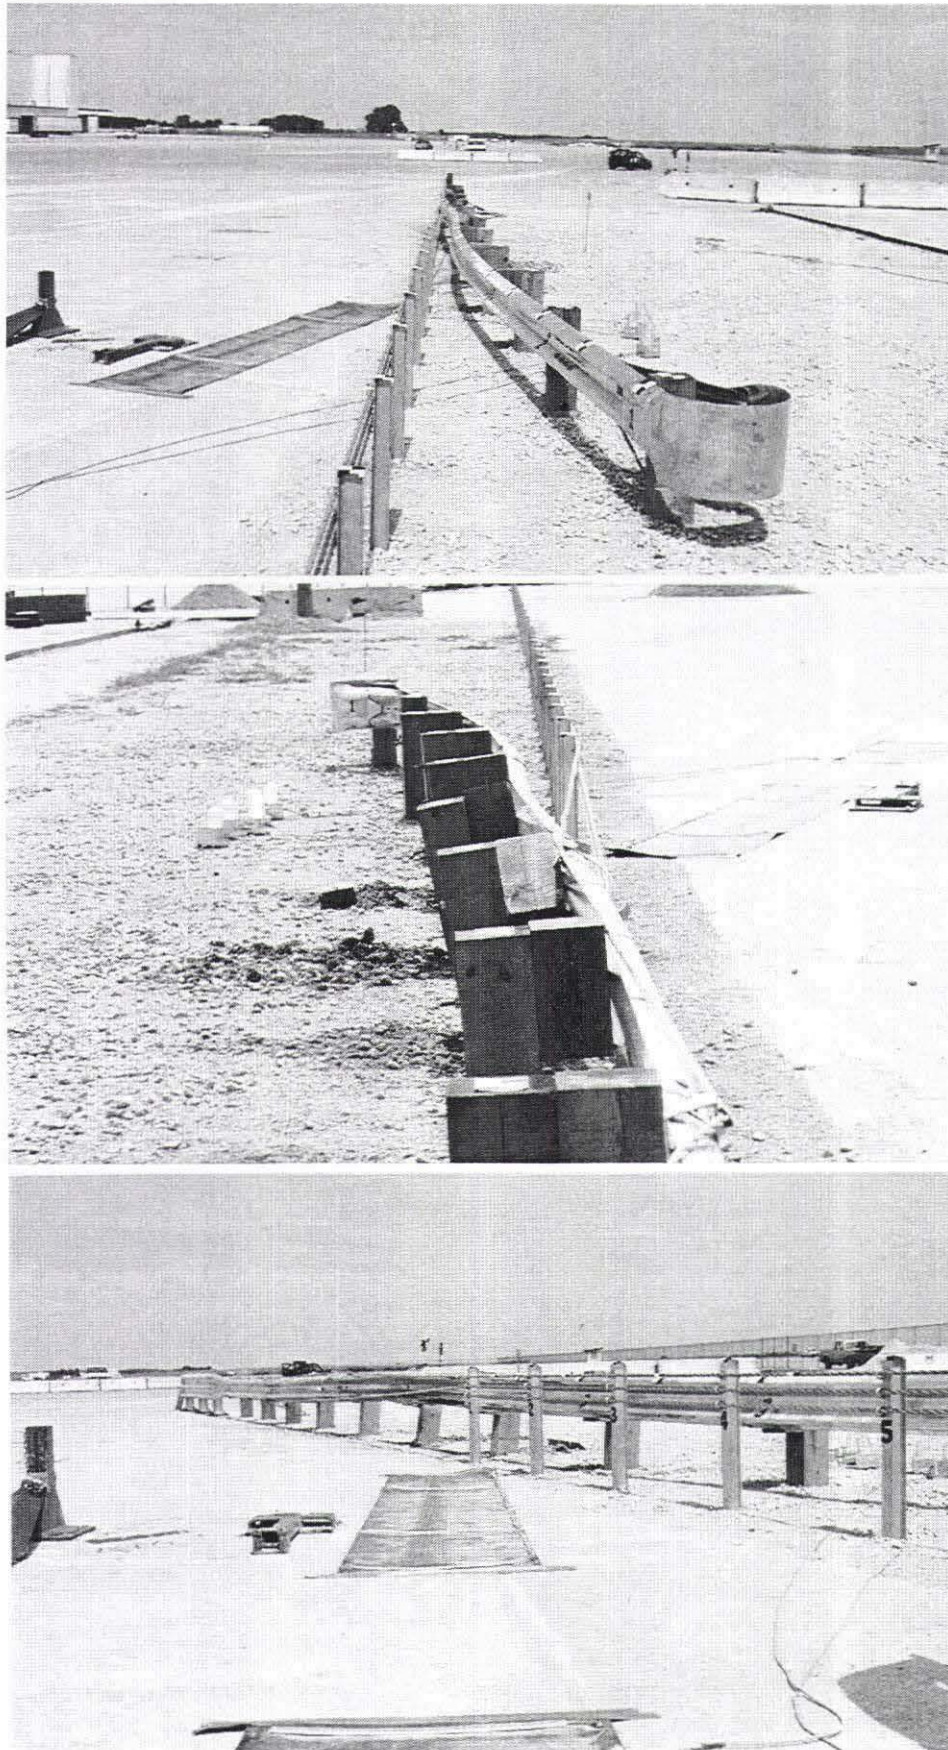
Cable Guardrail to W-Beam Transition Damage, Test SDC-3
